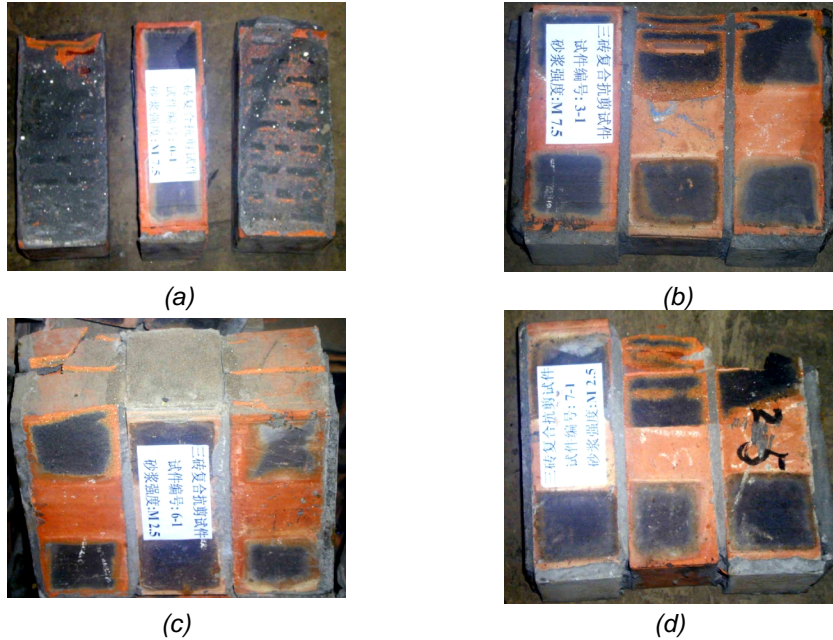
Failure modes of combined shear of perforated brick masonry
